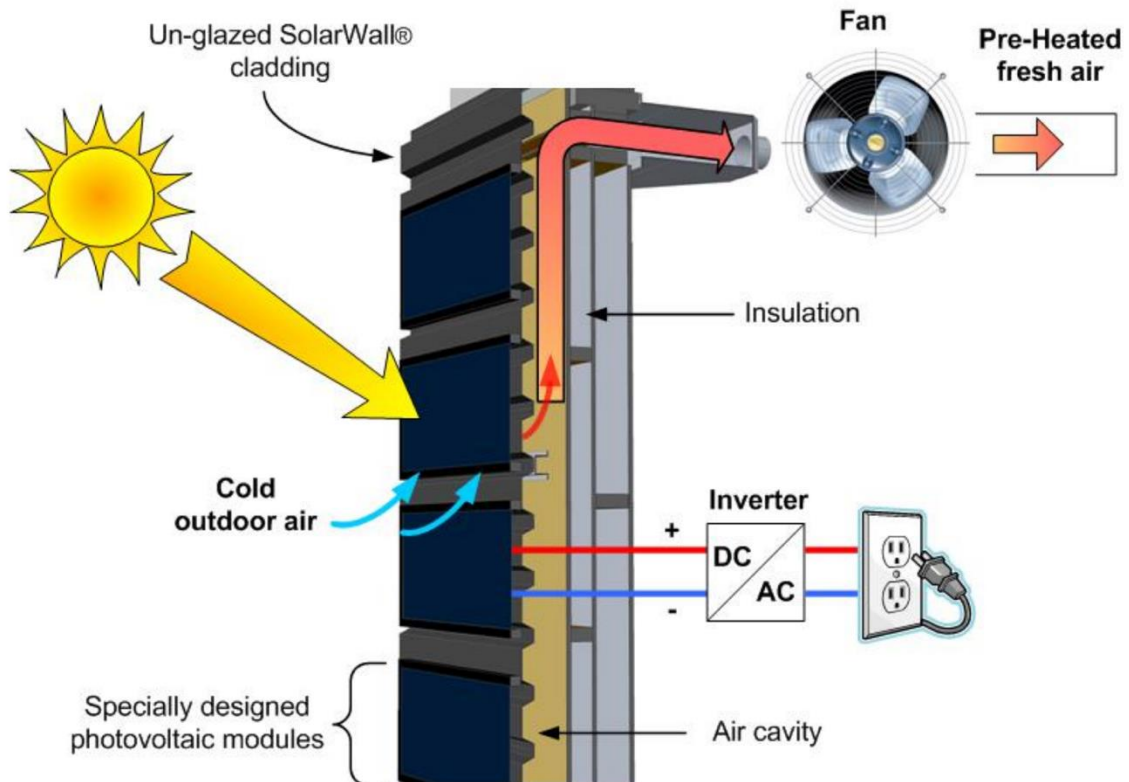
A schematic image of the building's existing solar wall (Oneil, 2009)
